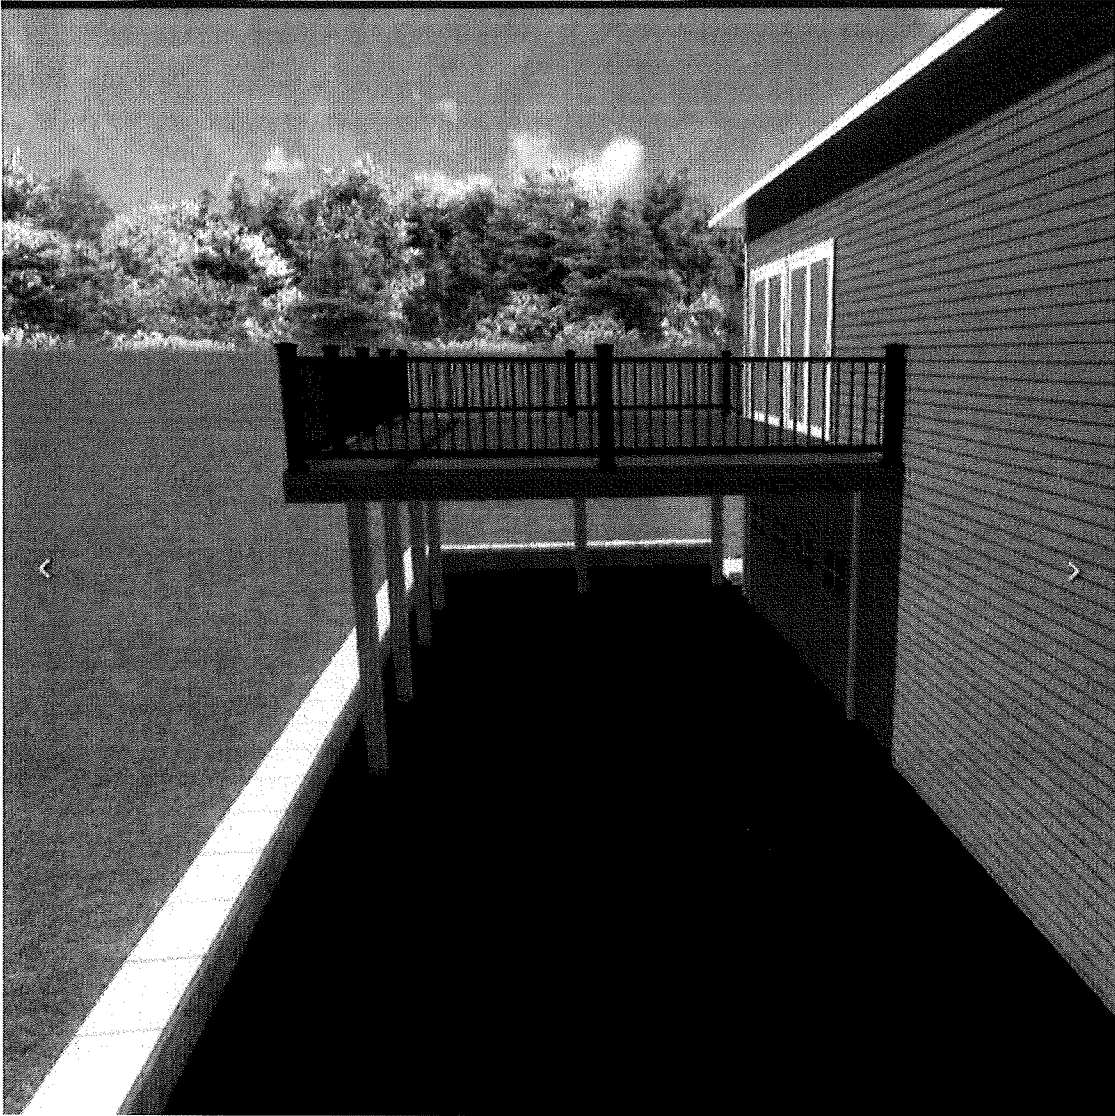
Rendering of new deck proposed for 59 Lincoln Pkwy.
